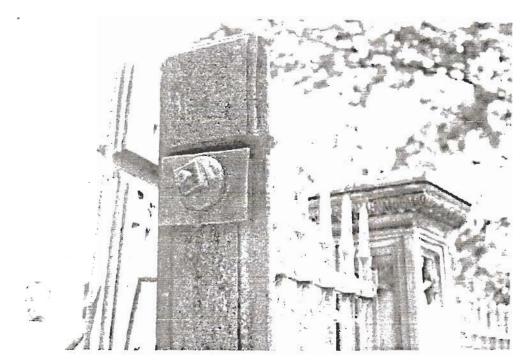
Detail at Capital of Damaged Cast Iron Fence Columns (South Gate).
